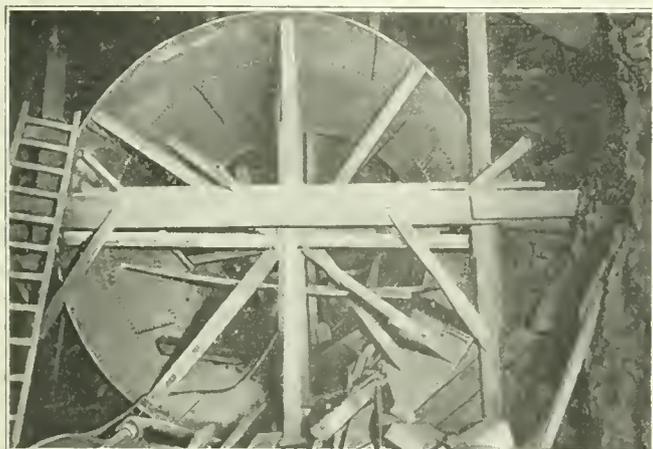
INTERLINING MUD SEAM, RONDOUT TUNNEL
